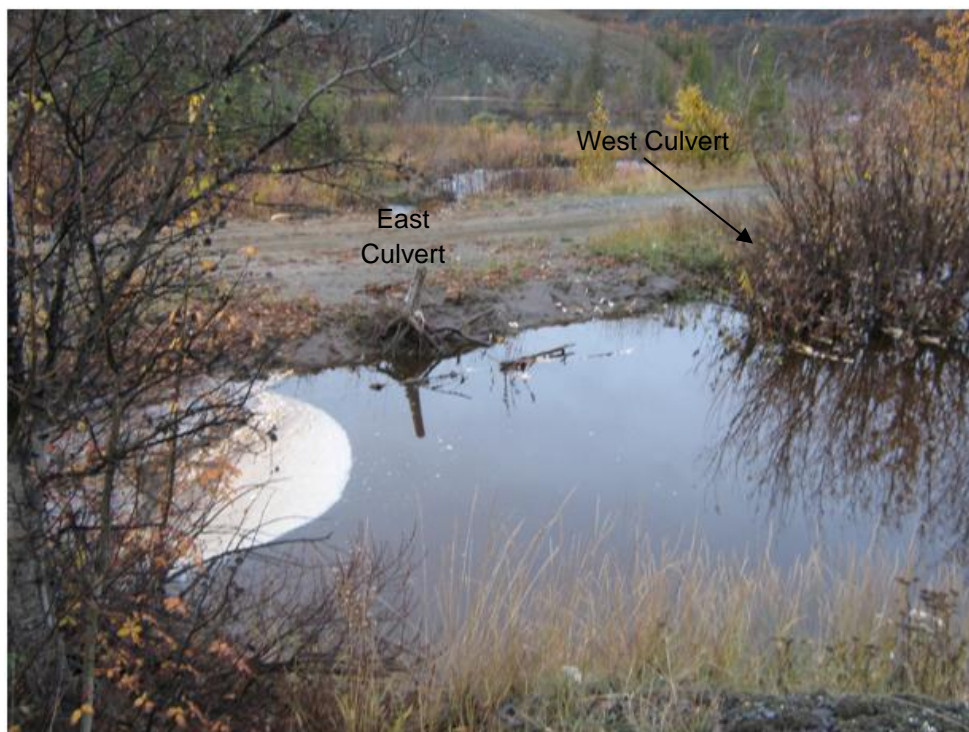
Wolverine Creek Road Crossing. Existing culvert inlets blocked by debris.
